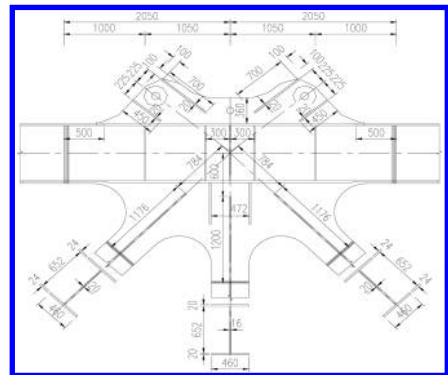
Scheme II: Structure of central buckles cable-girder anchorage joint plate (unit: mm).
